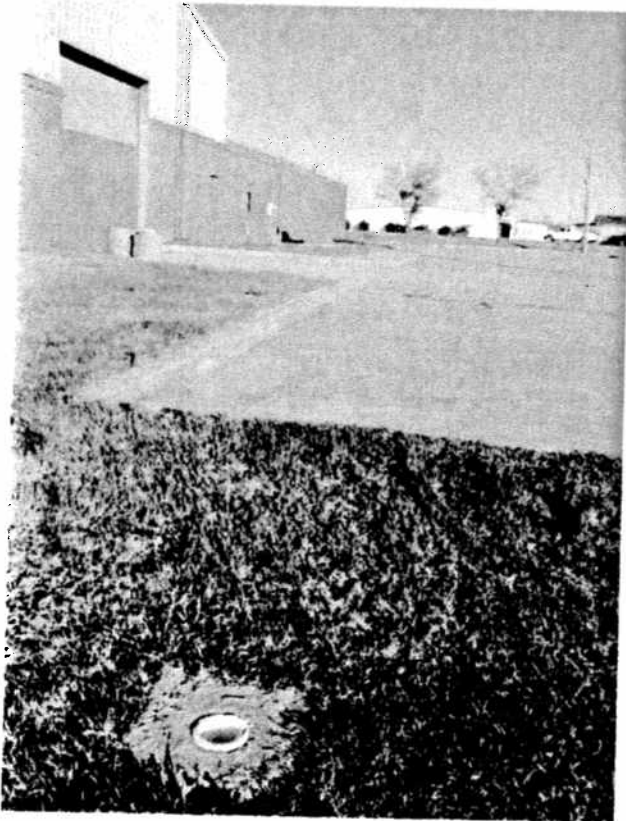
Open sewer vent pipe south east of east drill floor door –facing northwest.
